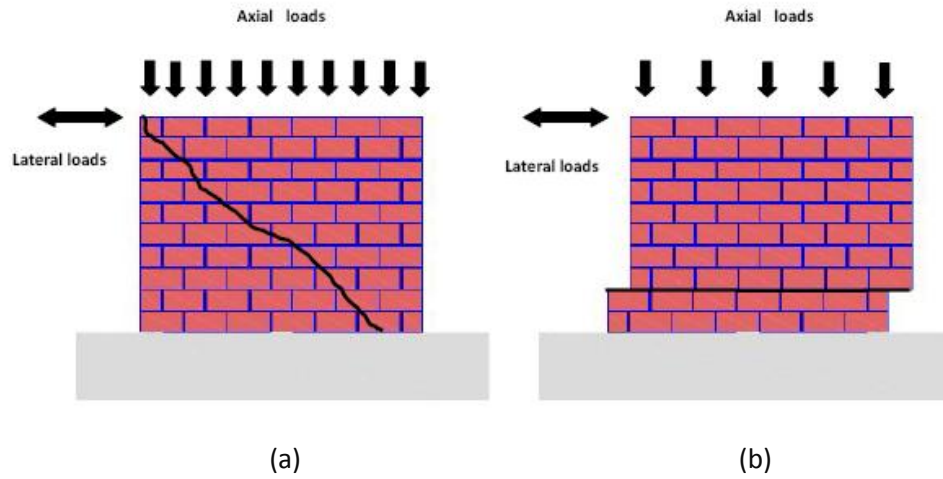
Shear failure mechanisms: a) diagonal cracks, b) bed joint cracks
